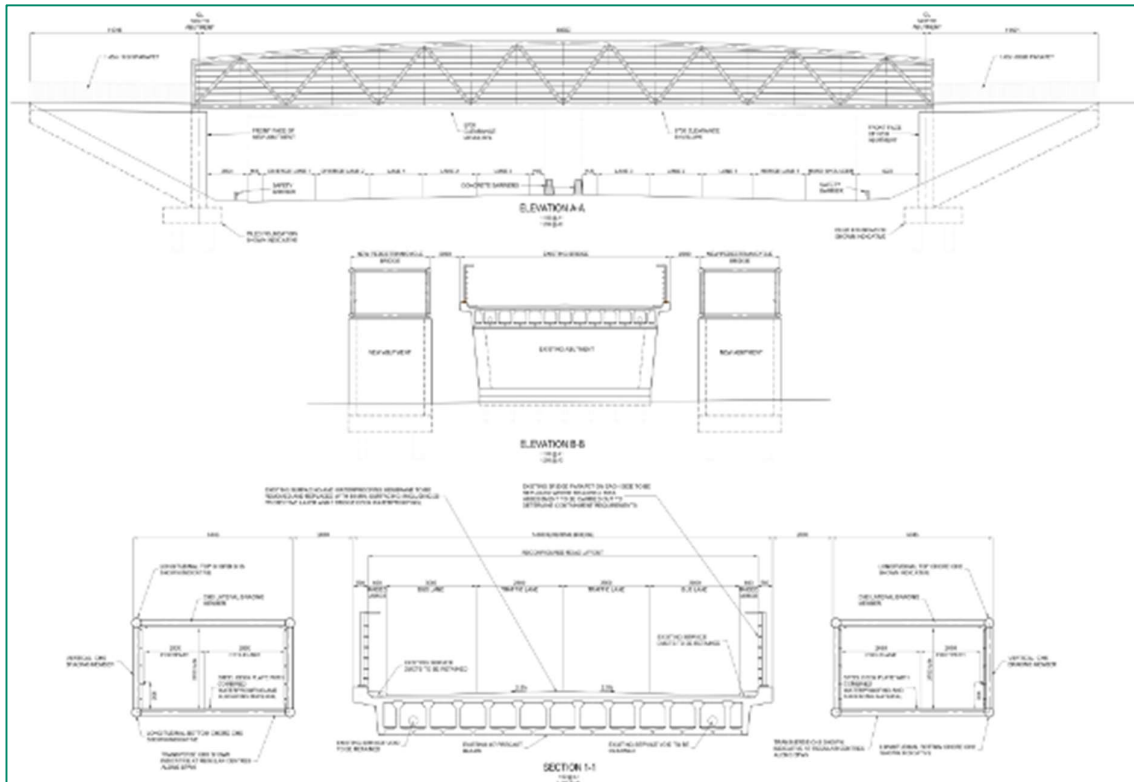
Extract of Bridges and Major Retaining Structures Drawings at R819 Greenhills Road interface with M50 – Elevation and Section
